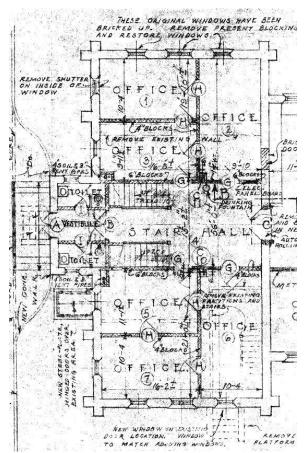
, Fredericksburg Courthouse, Detail, North wing, first floor. J. Binford Walford & O. Pendleton Wright, Renovation drawings, 1948. Courtesy City of Fredericksburg.
